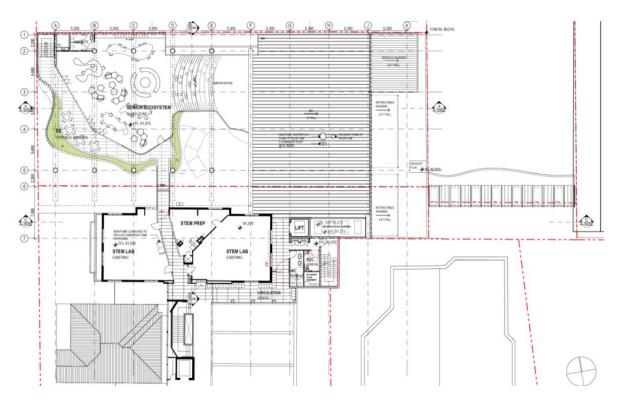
Ground Floor Plan showing new STEM hubs, school spine and new bridge connection
